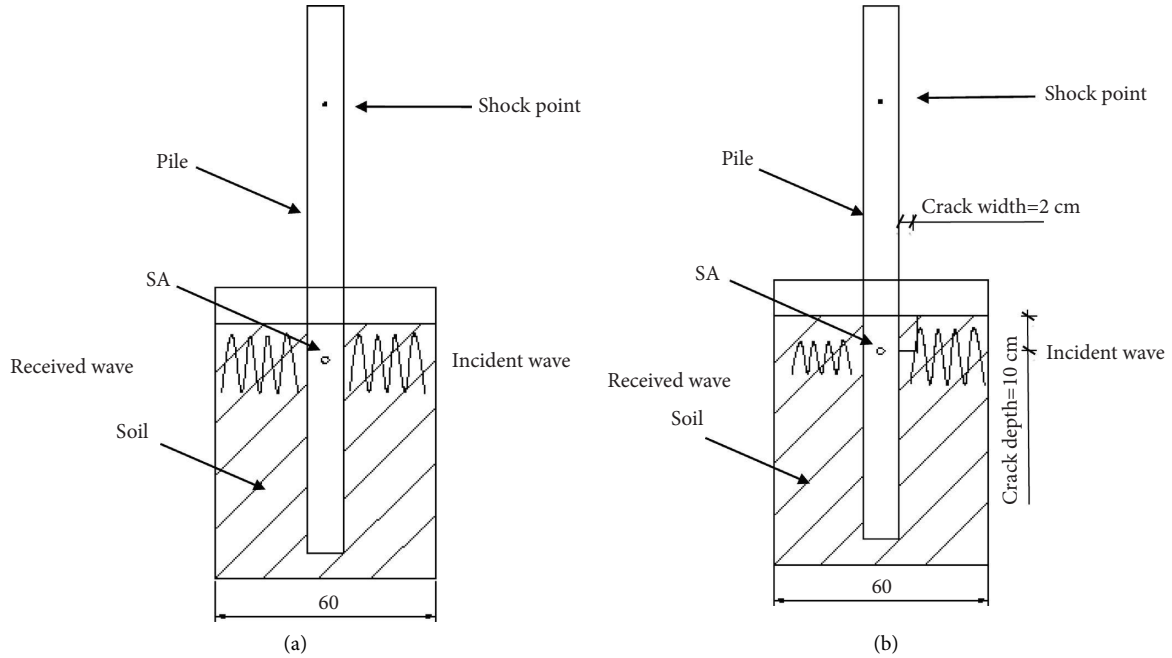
An active sensing method for pile damage detection based on the stress wave. (a) Pile foundation without spalling damage. (b) Pile foundation with spalling damage.
